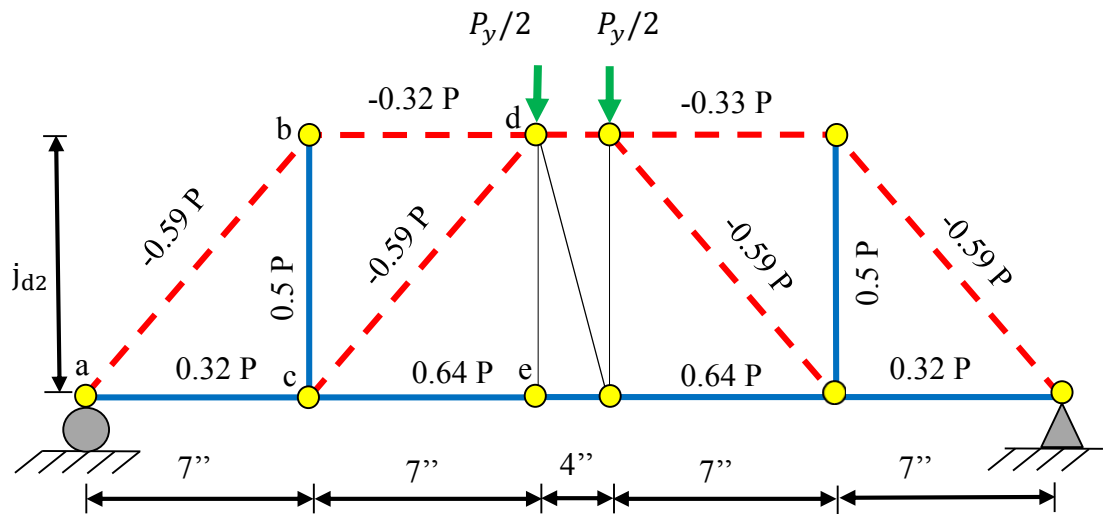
Truss 2 (concrete + CFRP) model of beam specimen (CSW-GSP)
